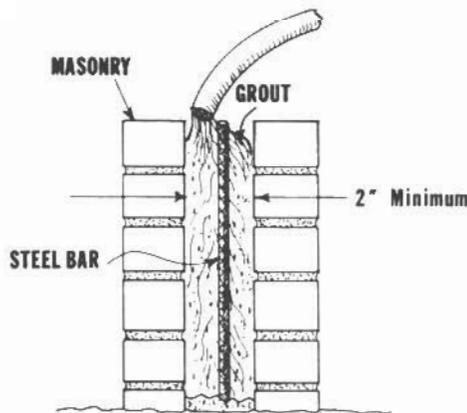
Grout Being Pumped into Two-Wythe Brick Wall.
